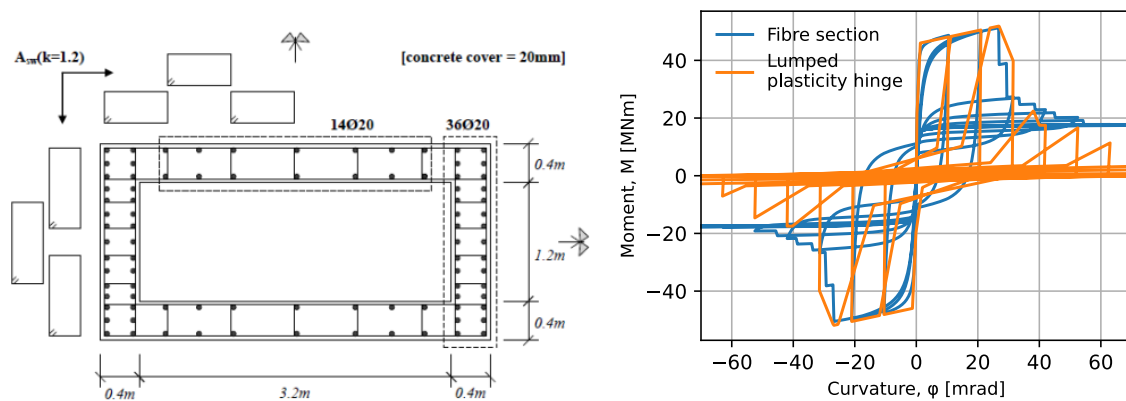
Illustration of structural detailing of the pier cross section [13]. The shorter side of the section is placed in the direction of the bridge deck (left). Moment curvature analysis of bottom section of the Pier with 7 m height. 10 cycles of unloading/reloading are shown here as an example, with equal curvature increments until the target curvature (right).
